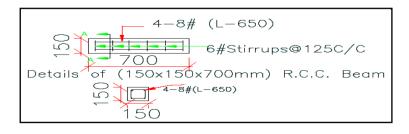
Detailing of Reinforcement in RC Beam Specimen
